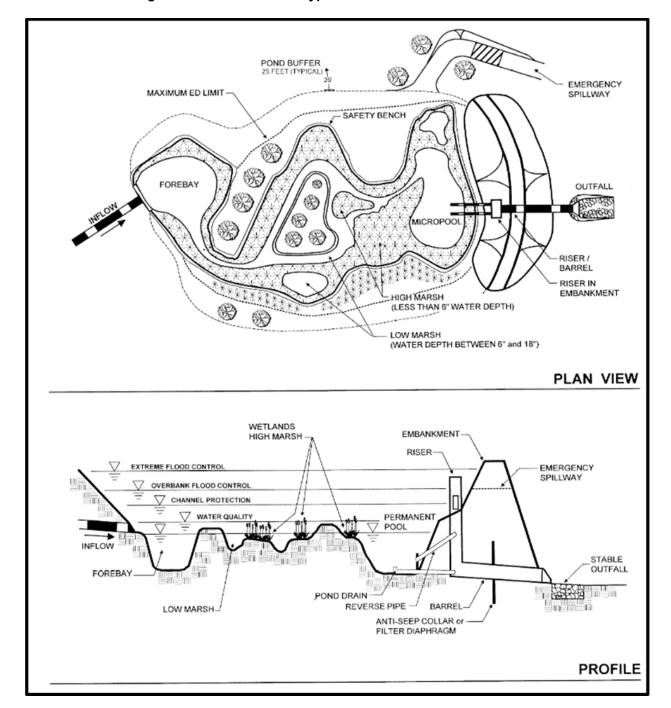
Schematic of a Typical Shallow Constructed Wetland
